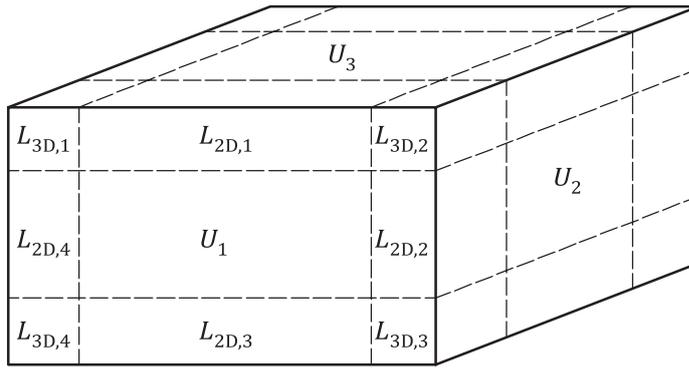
Building envelope partitioned into 3-D, 2-D and 1-D geometrical models
